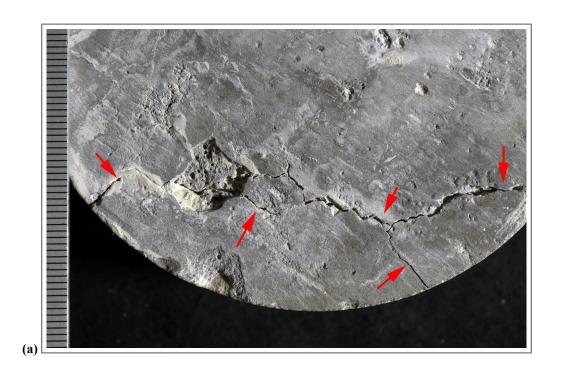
Photograph showing detail of inner fracture surface; scale in millimeters. Note the white deposits of ASR gel on the surface.
